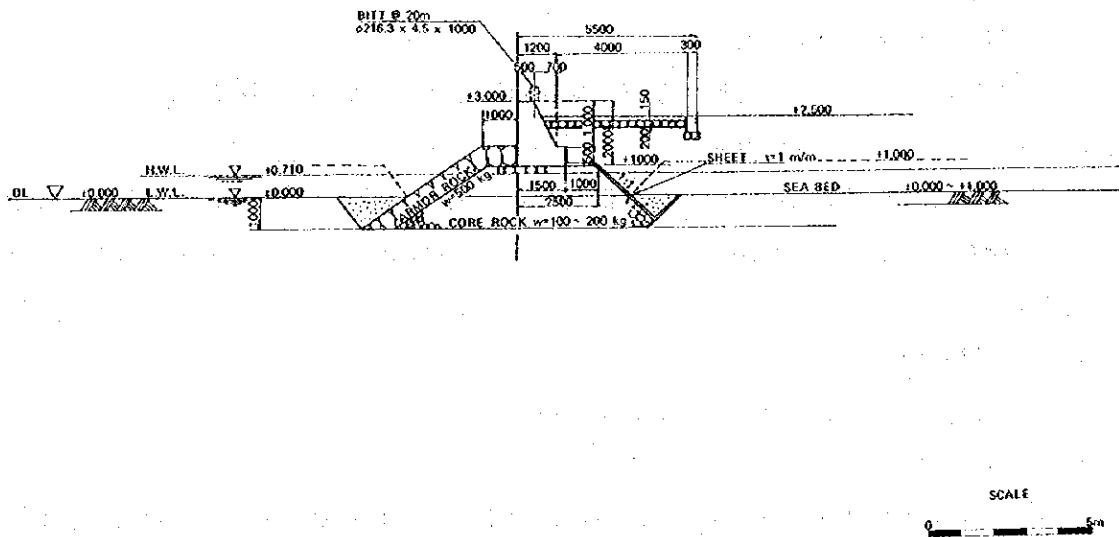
Cross Section of Rock Bulkhead – Sual Port
